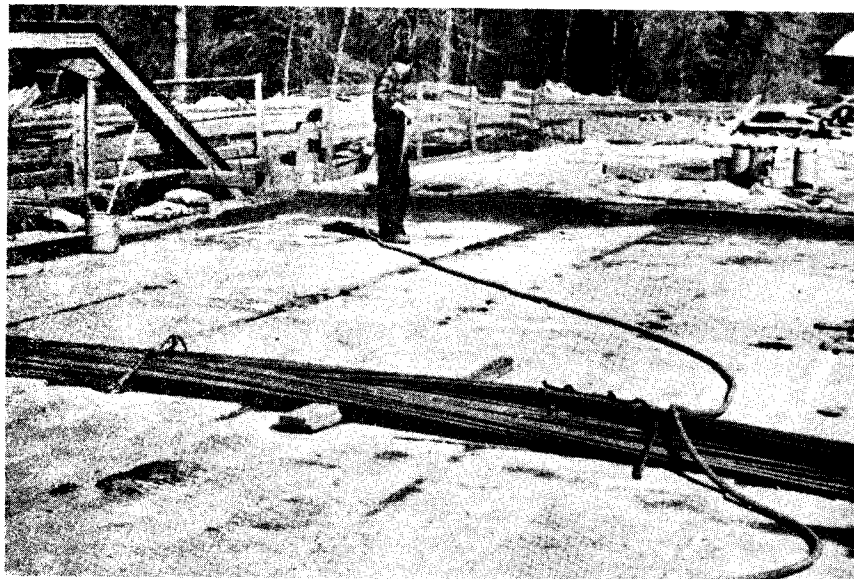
Compressed air is used to remove debris from top of beams prior to placement of reinforcing steel for overlay.
